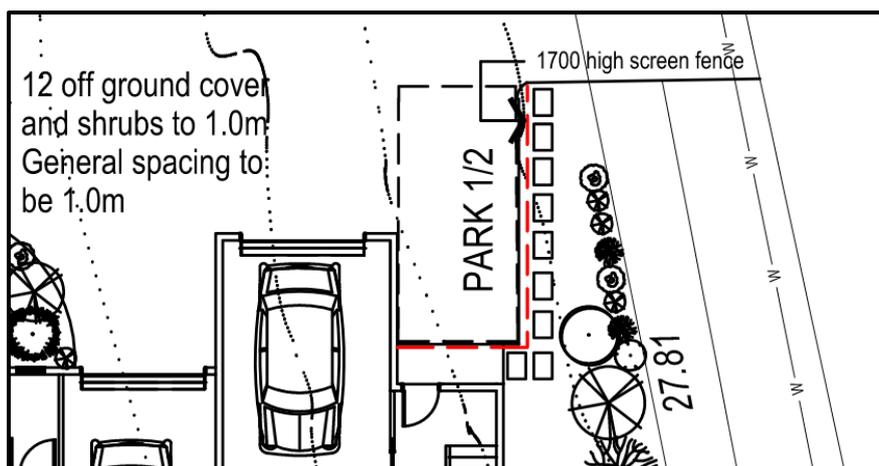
Unit 1 site plan for 21 Coleman Street, Moonah.
